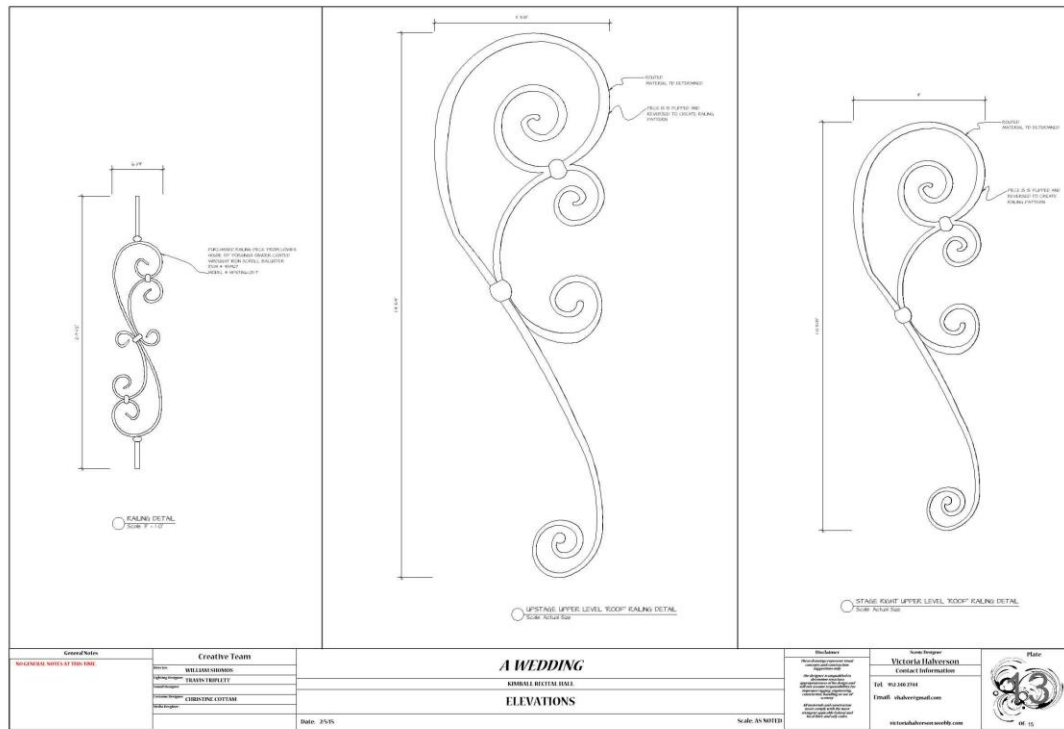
are all elevations of the different scenic units needed. Each has a plan view (as if seen from a bird's eye view), elevation view (as if looking at the piece straight at eye level) and a section view (showing details as if it were cut through). All of these were created using the 3D model (seen in Chapter 1.5) pieces. The same principles applied to these as to the section on plate two, described on page 37.
